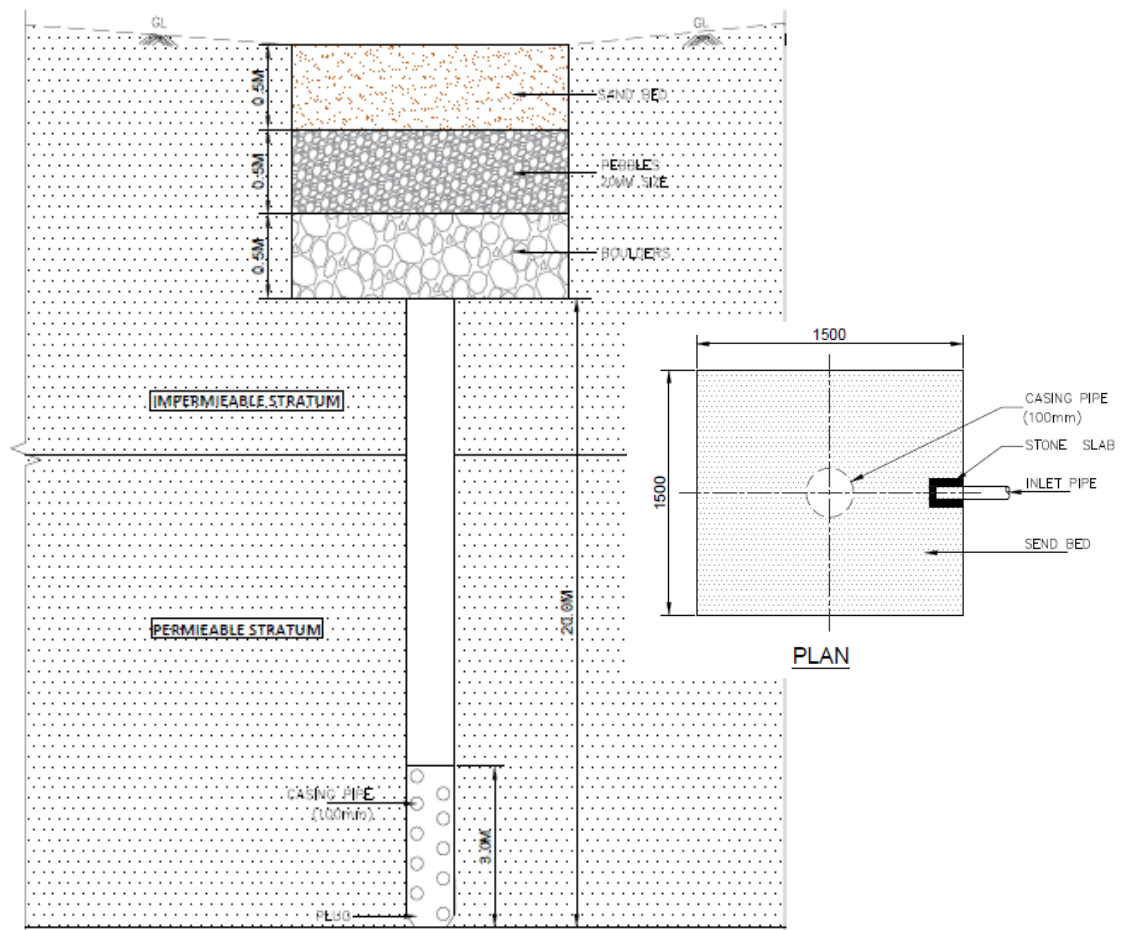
Typical Drawing of Ground Water Recharge Pit
